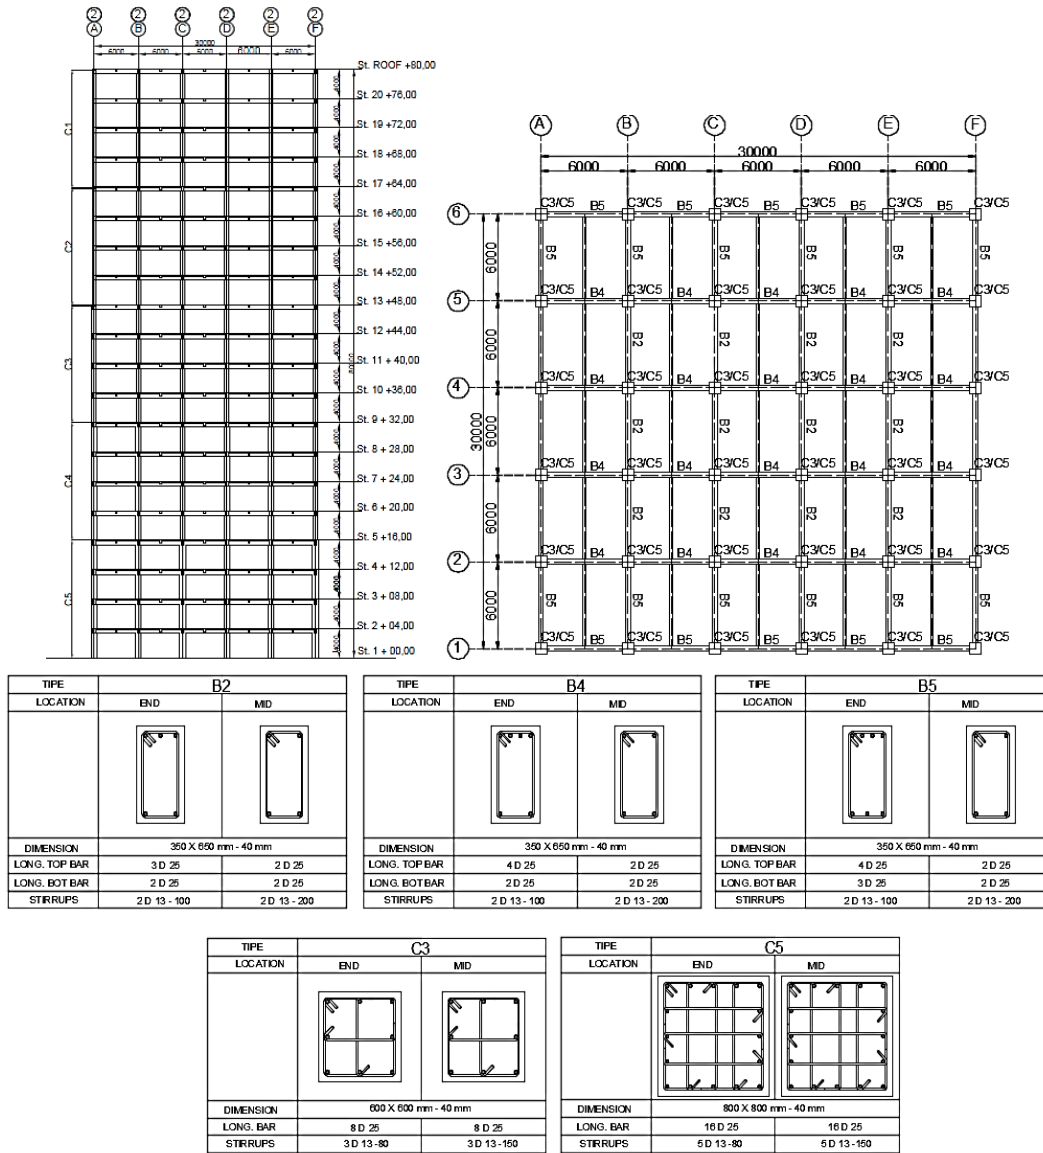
Structural Configuration and Controlled Beam/Column Reinforcement of Selected Building (Purba, 2016; SNI, 2013)
